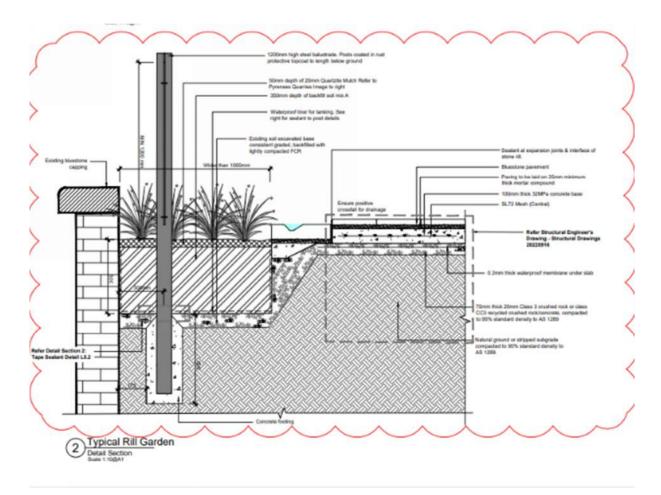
Detail showing section through proposed balustrade, bluestone rill and garden surrounding Day Basin, excerpt from GbLA drawing L5.2. (Source: GbLA, 2023)
